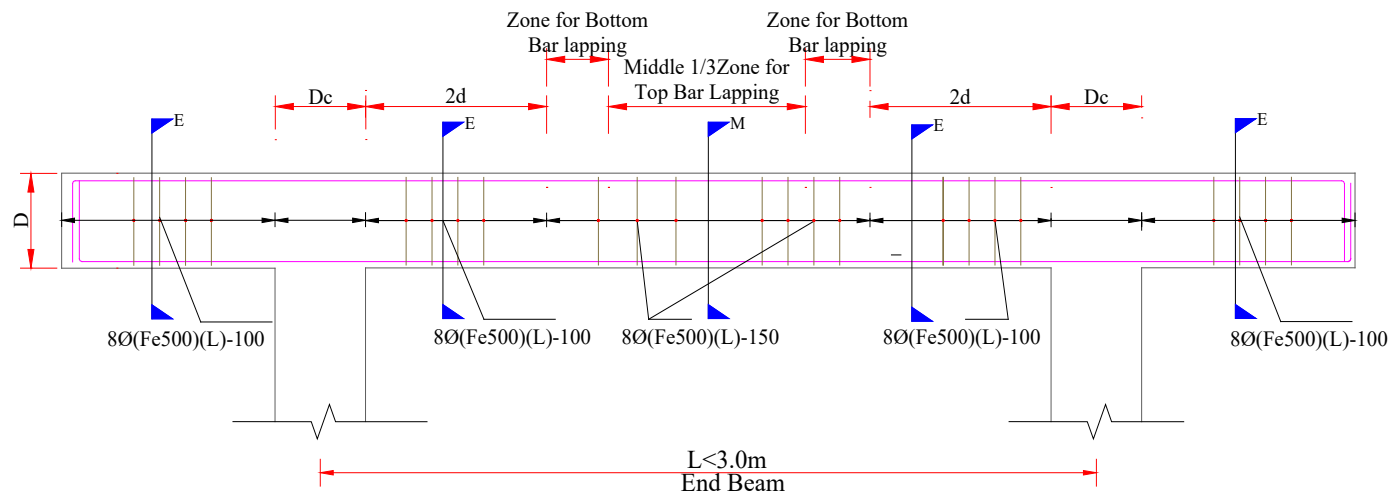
TYPICAL FLOOR BEAM DETAIL OF THREE STOREY BUILDING
